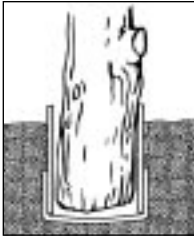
Wooden footings can be protected from rotting in the soil by using capped PVC pipe.
